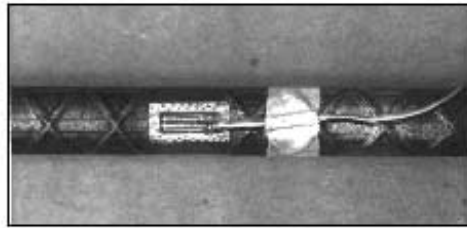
A weldable strain gauge attached to a reinforcing bar
